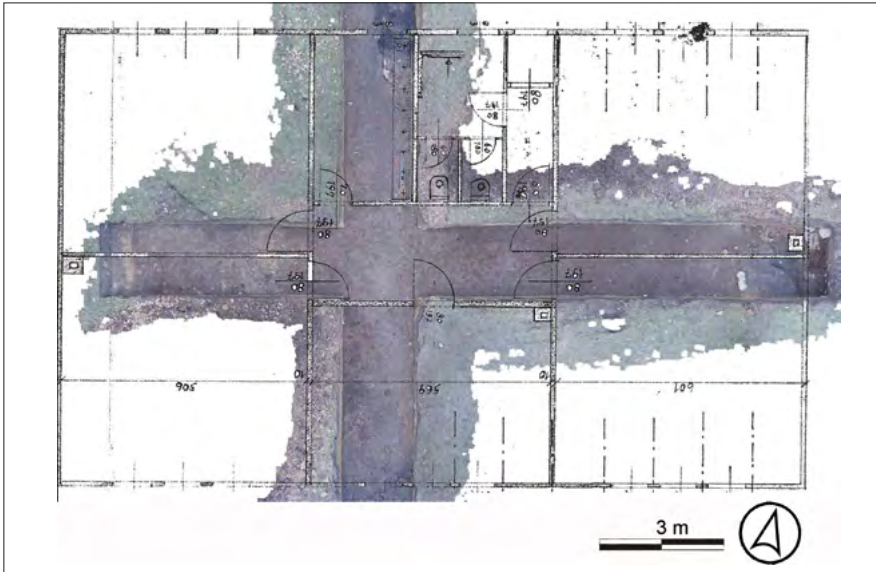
Excavated remains of a dwelling house in the sw corner of the camp projected with the original building plan (see Fig. 5).
